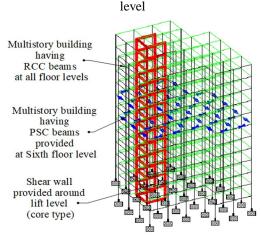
Model OPSC-BVI - General Structure with PSC beam provided and interchanged at sixth floor
